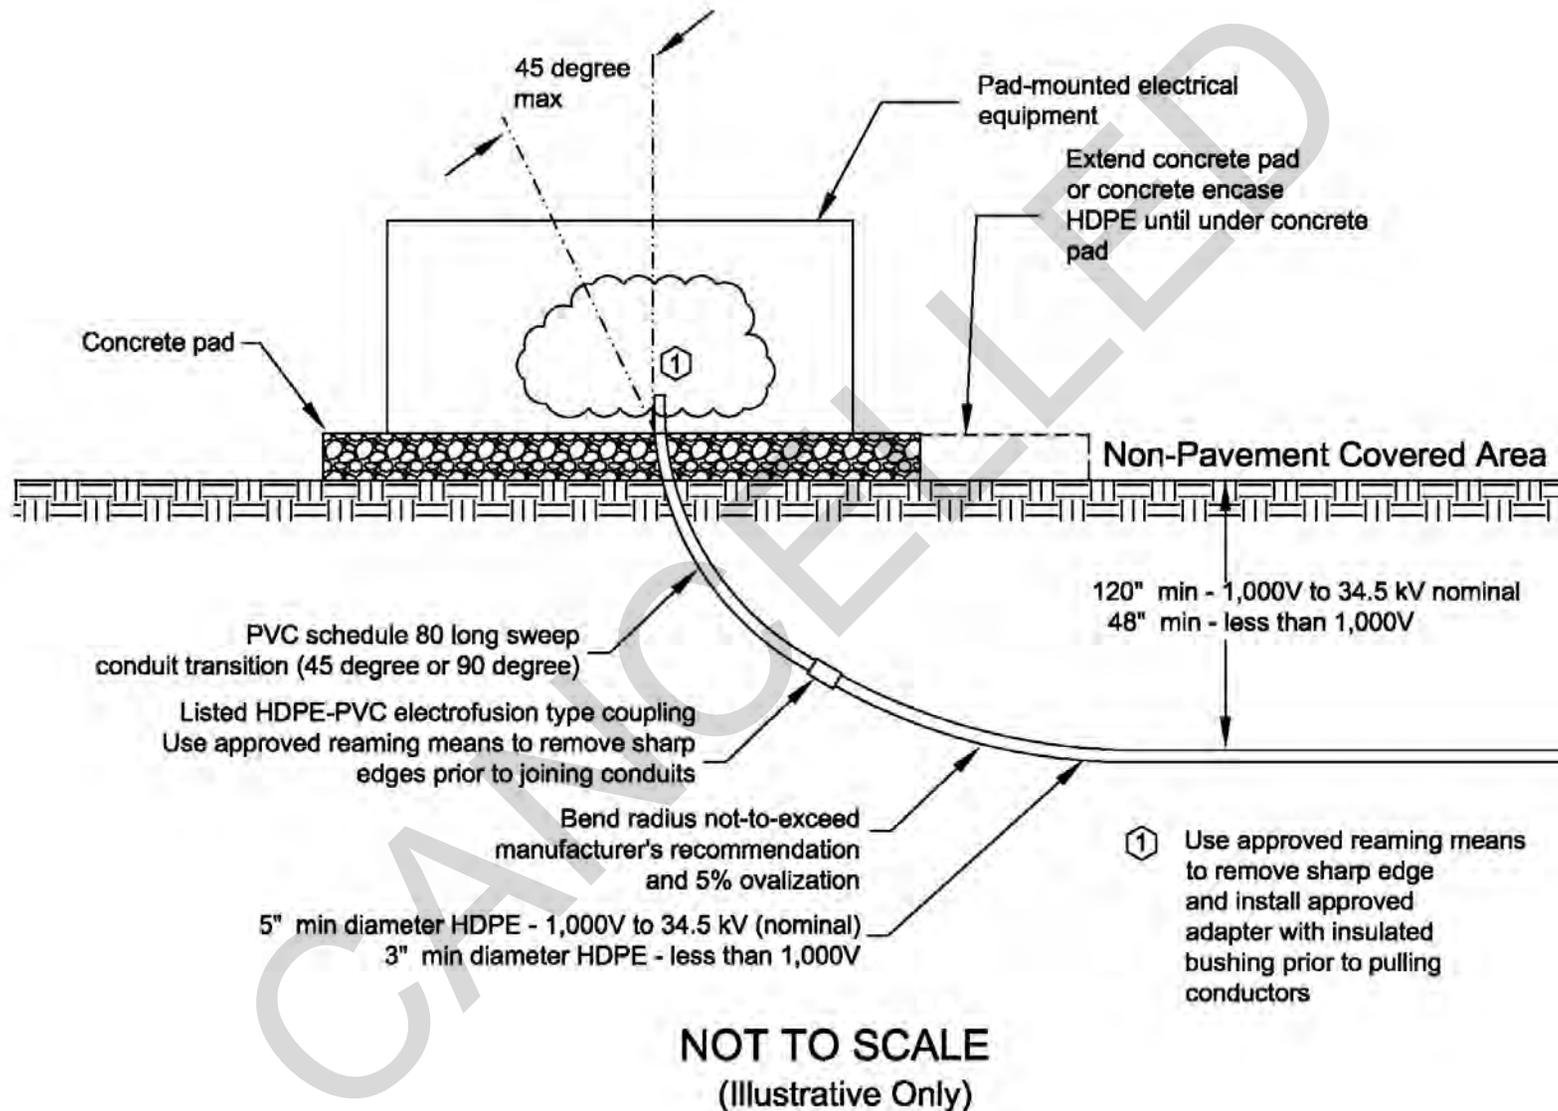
Non-Pavement Covered Area to Electrical Equipment Transition – Rigid Conduit (45°–90°)
